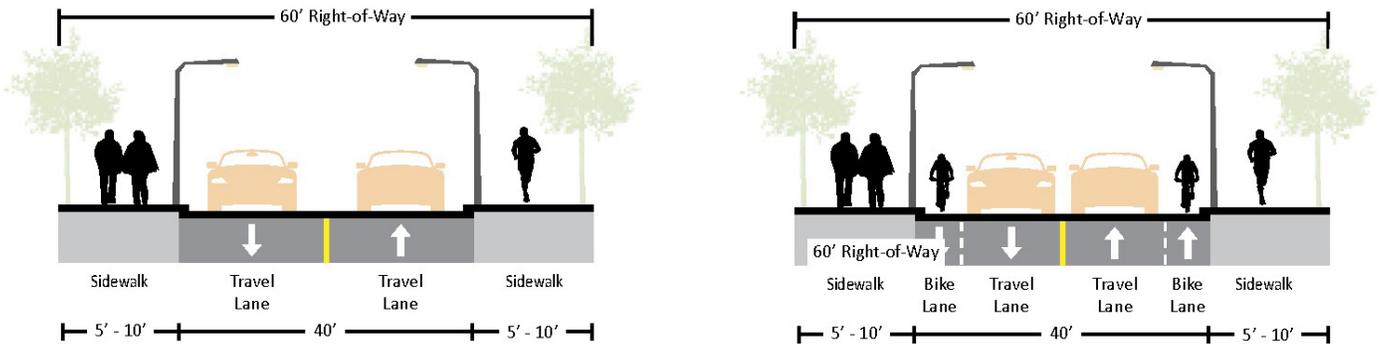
Street Sections – Secondary Arterial, Collector, and Park Blvd
